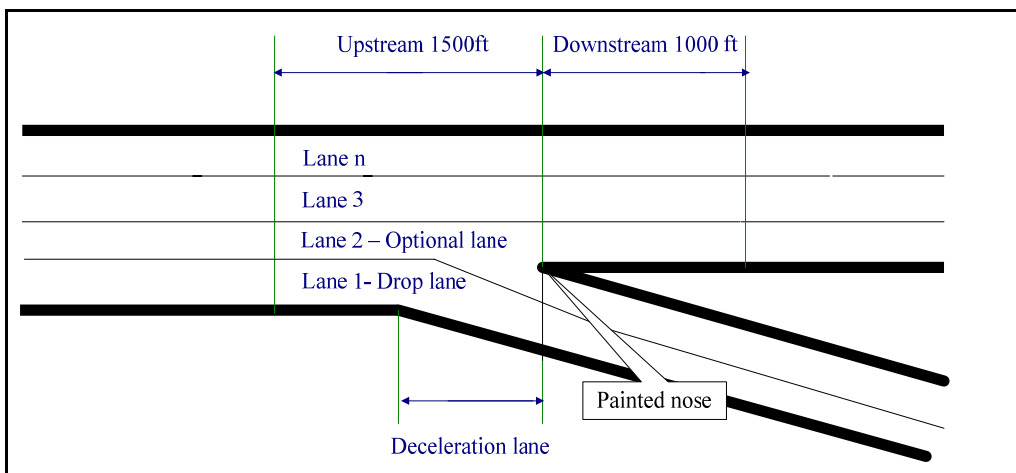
Type 3 Exit Ramp: Two-lane Exit Ramp with an Optional Lane
